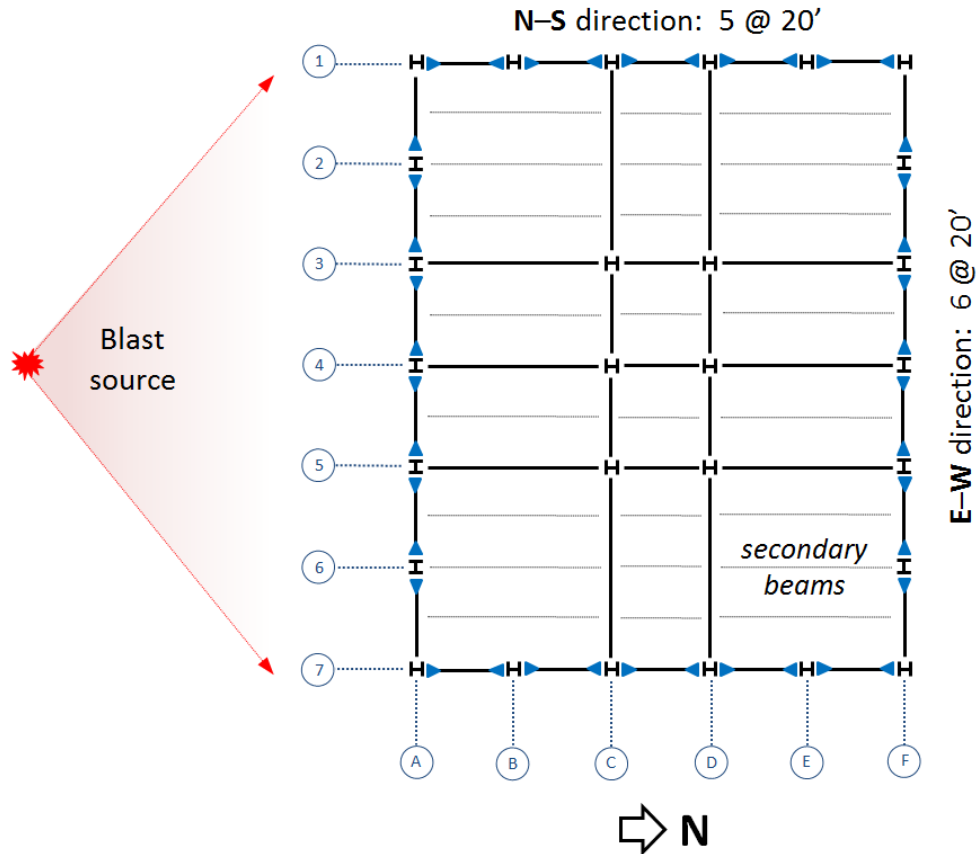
Plan view and geometry of 20-story building with perimeter moment resisting frames. Locations of fixed beam-column connections are denoted by blue triangles.
